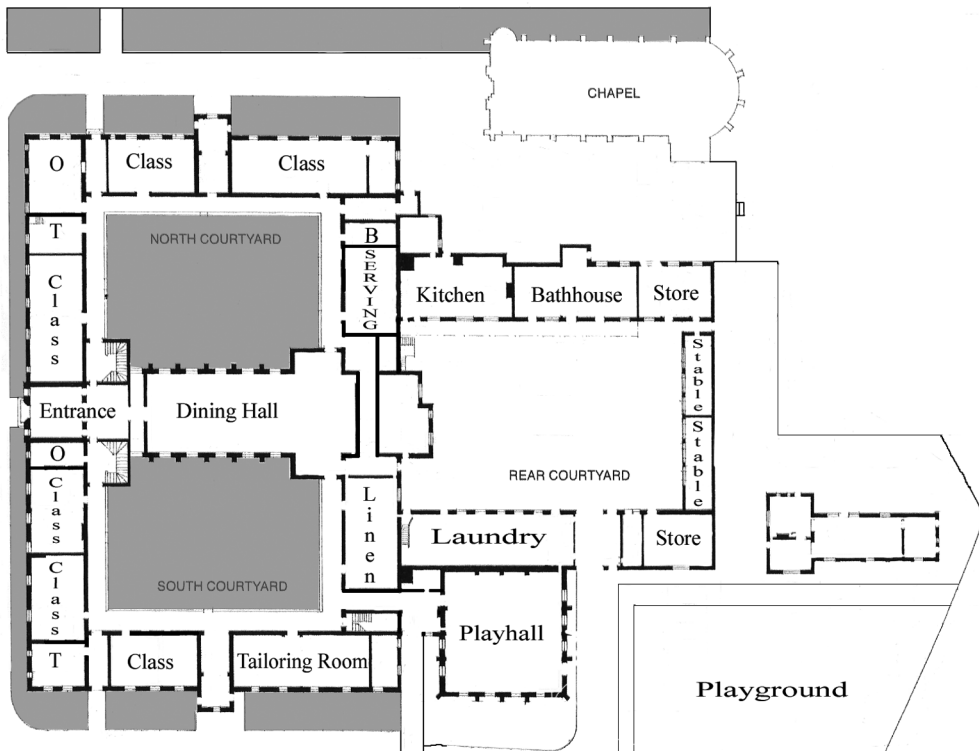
Ground floor plan; the main facade (224 ft in length) faces north-west
